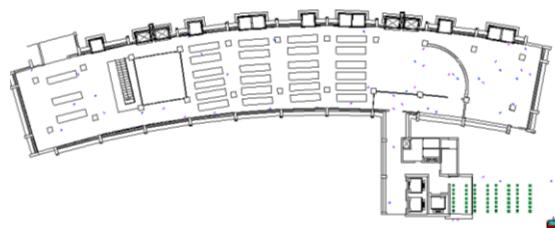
Geometry of the library building, 5<sup>th</sup> floor.
